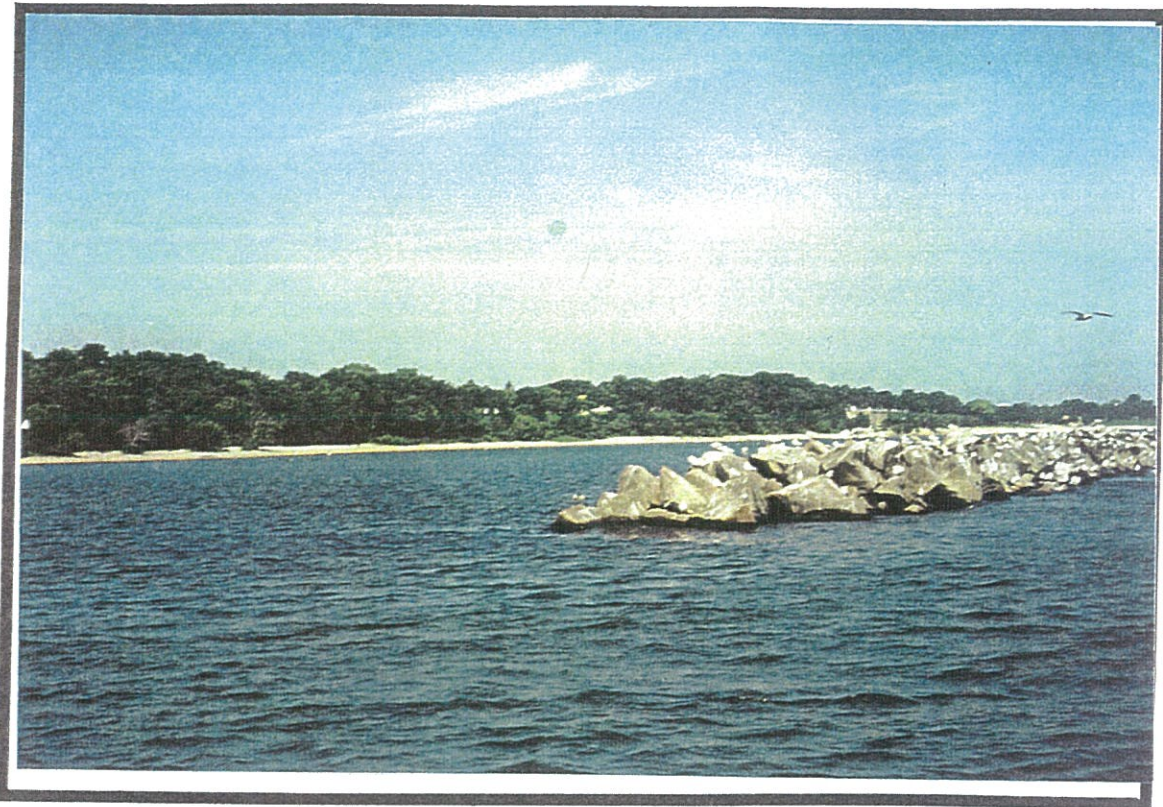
DESIGNED OPENING IN BREAKWATER – STONE FALLS OFF NEATLY/
